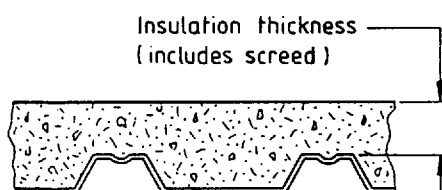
Insulation thickness for trapezoidal profiled steel sheets
